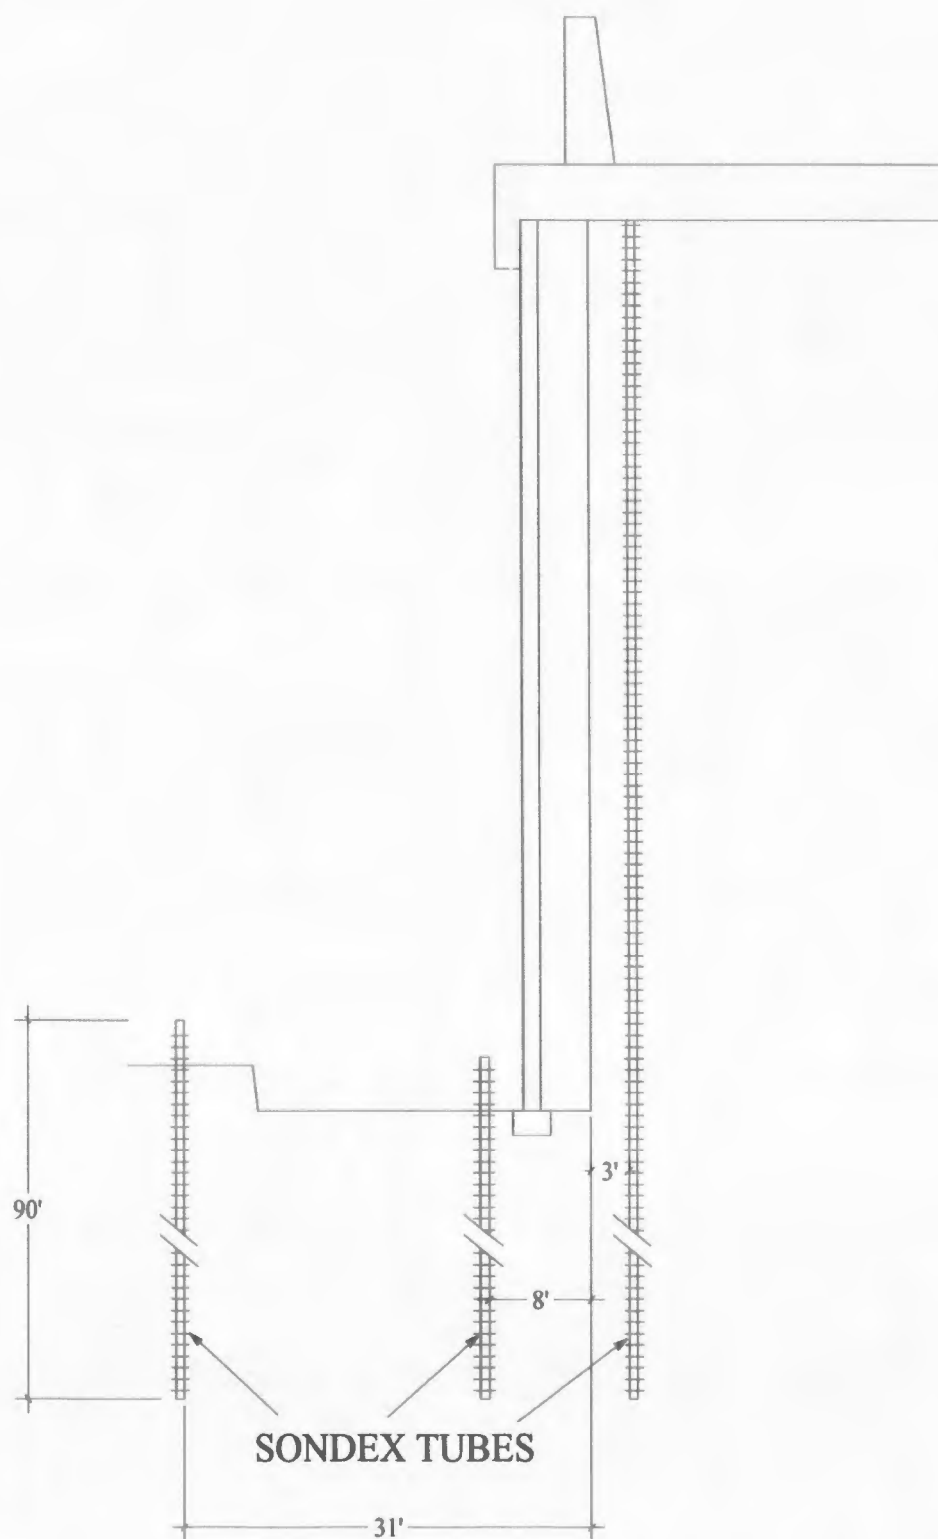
Elevation view of the instrumented section with the Sondex tubes S1, S2, and S3
